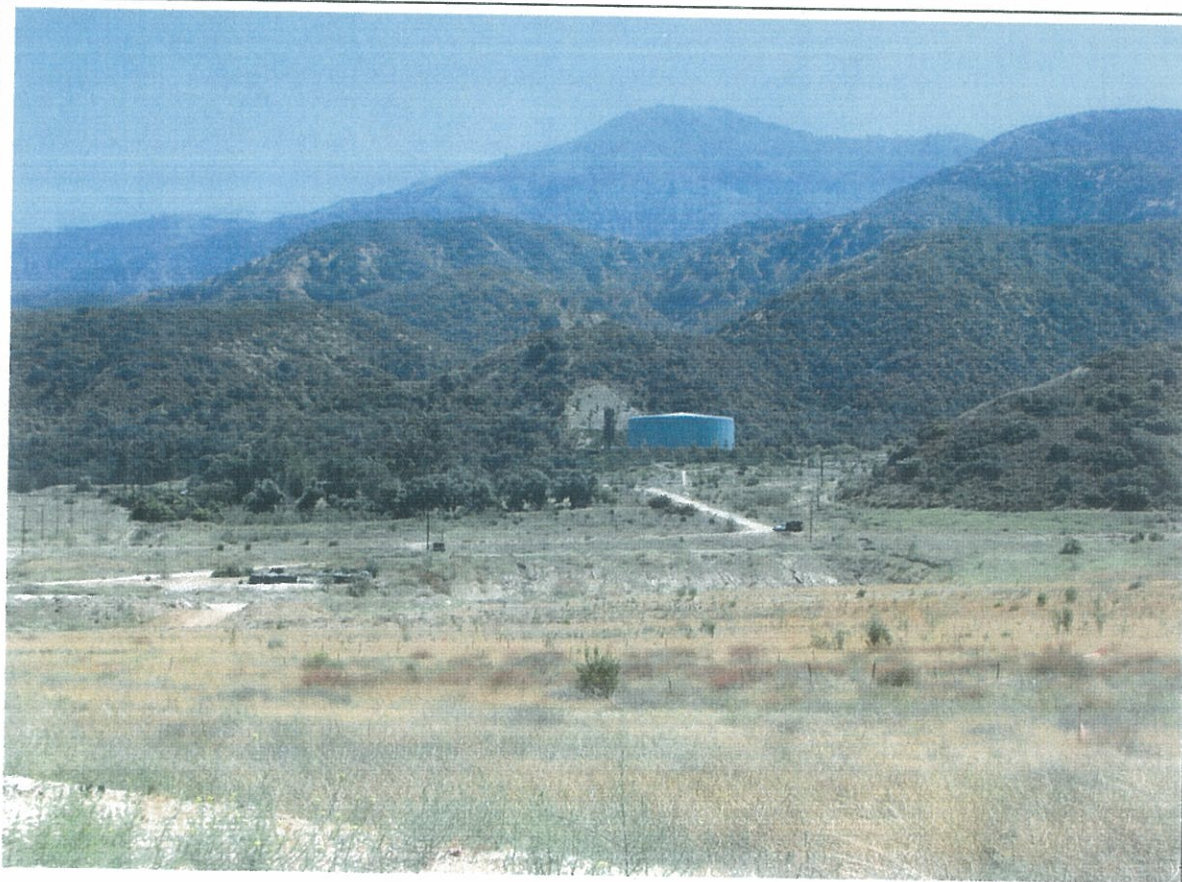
Looking Southeast from the Interior of the Project Area
